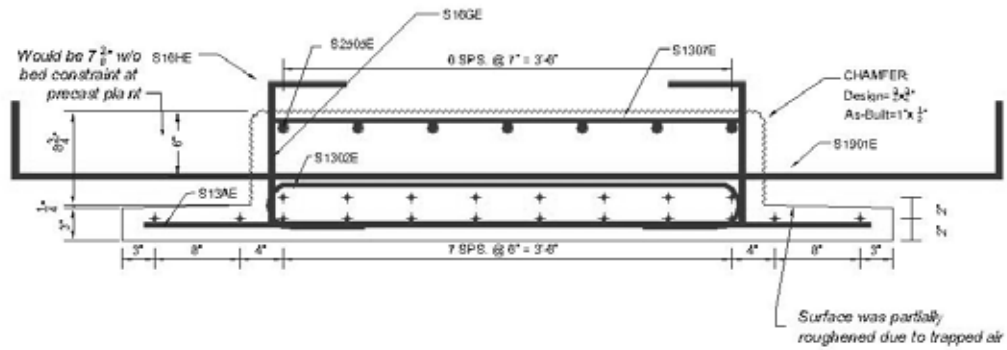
As-built cross section and reinforcement details for the east end of Beam 1S
